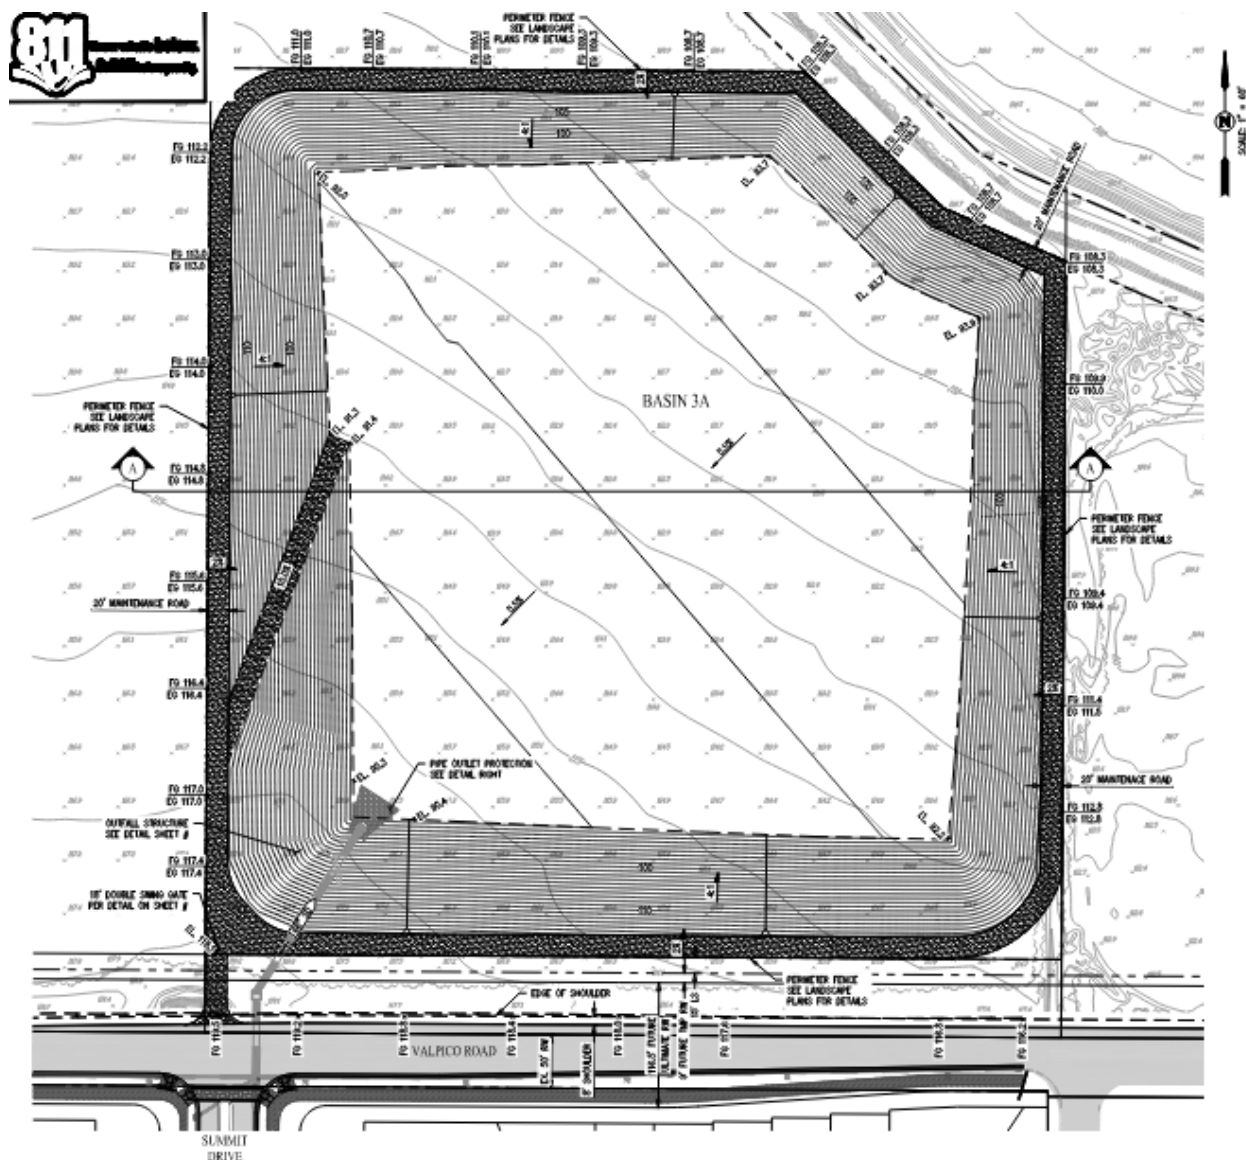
Basin 3A Plan. Excerpted from basin plans prepared by Carlson, Barbee & Gibson.
